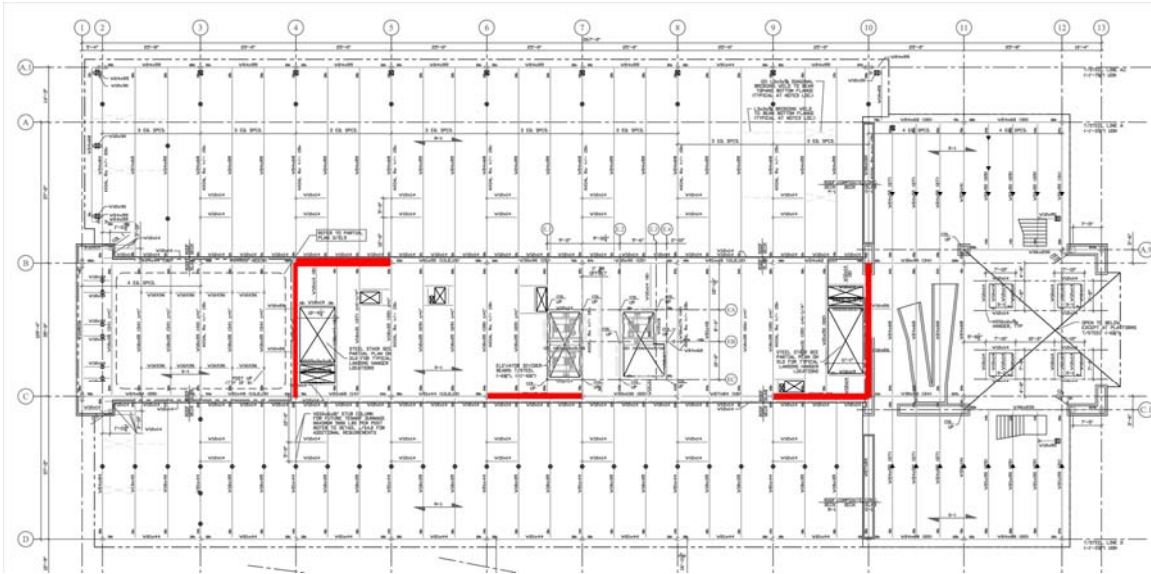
5<sup>th</sup> Floor plan with highlighted frames
